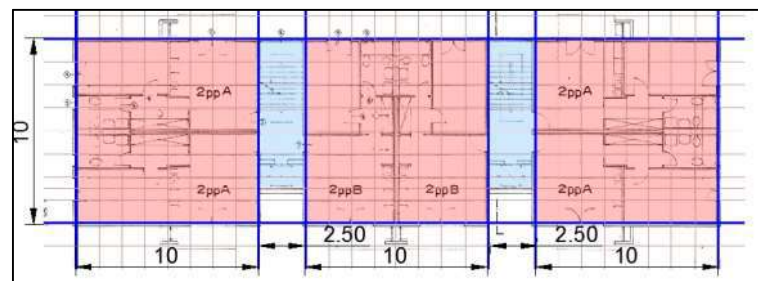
Typical floor Plan. Dimensions of the 3 identical boxes.
